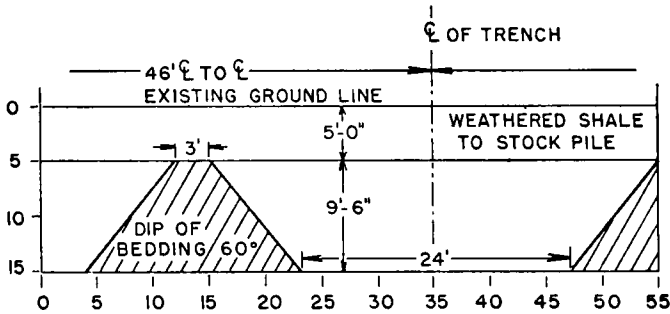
Cross section showing details of a trench-type landfill design (from Foose, 1972, p. 15).
